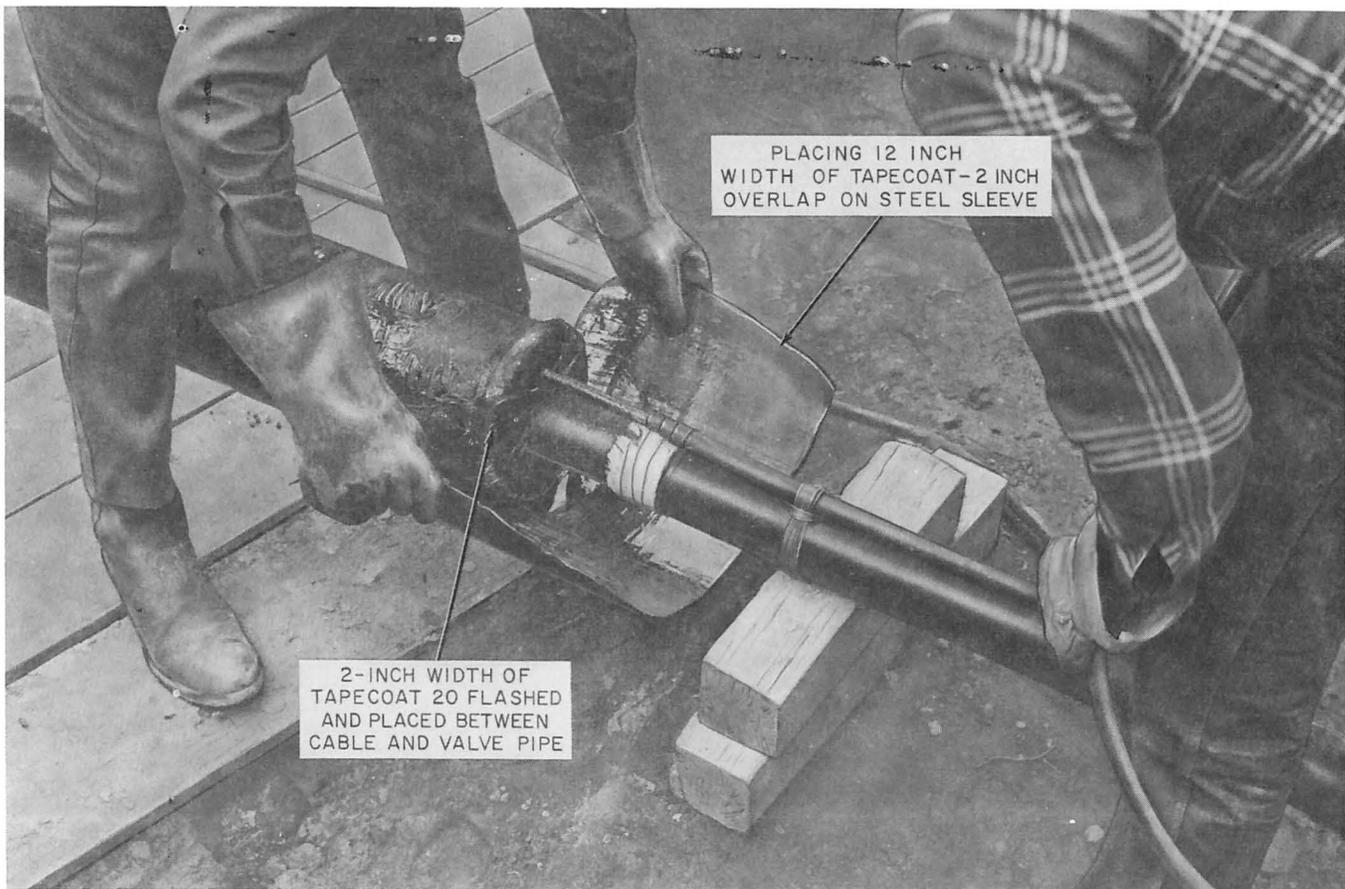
Applying Tapecoat 20 to Valve Pipe End of B Steel Sleeve
